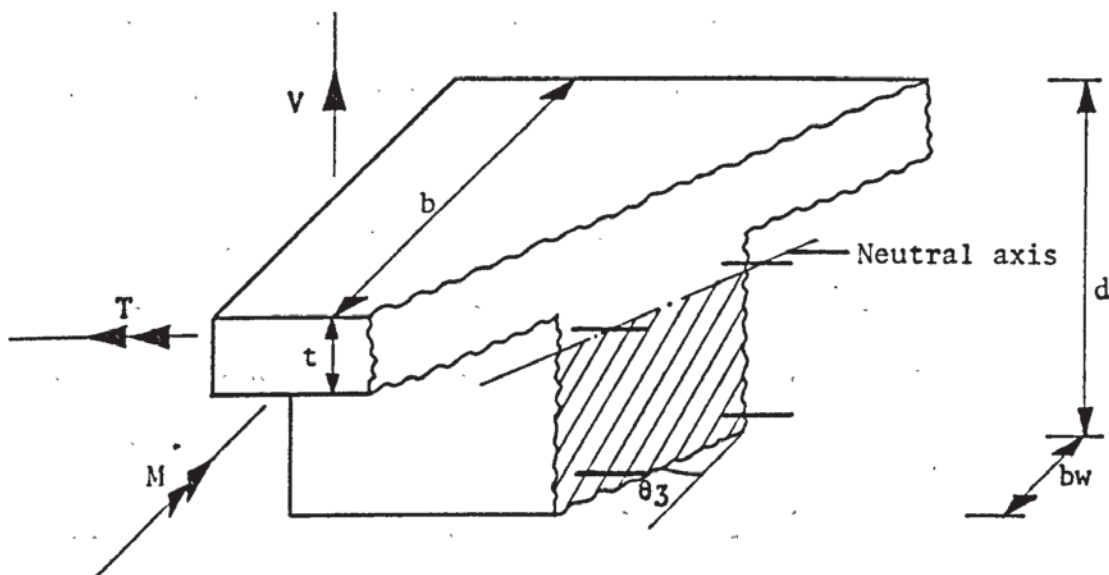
MODE THREE FAILURE IN PRESTRESSED CONCRETE T-MEMBERS UNDER COMBINED LOADING
